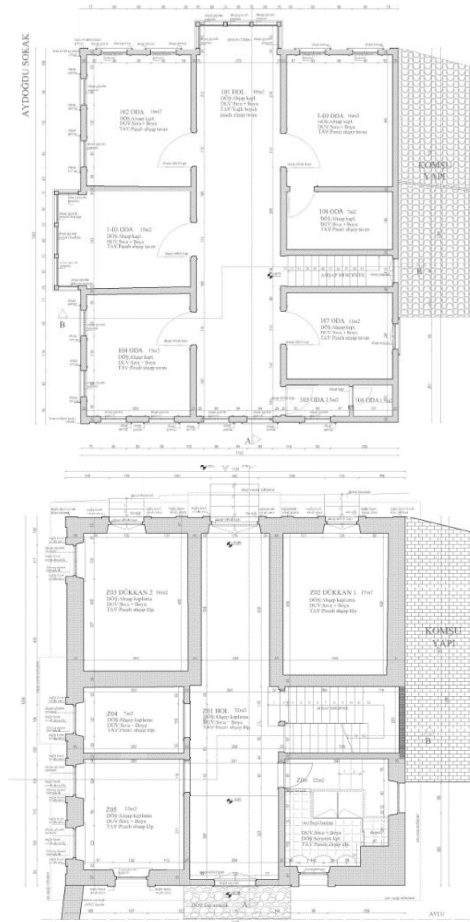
Abdi Ülgen House Plans (Yazar, 2010).
